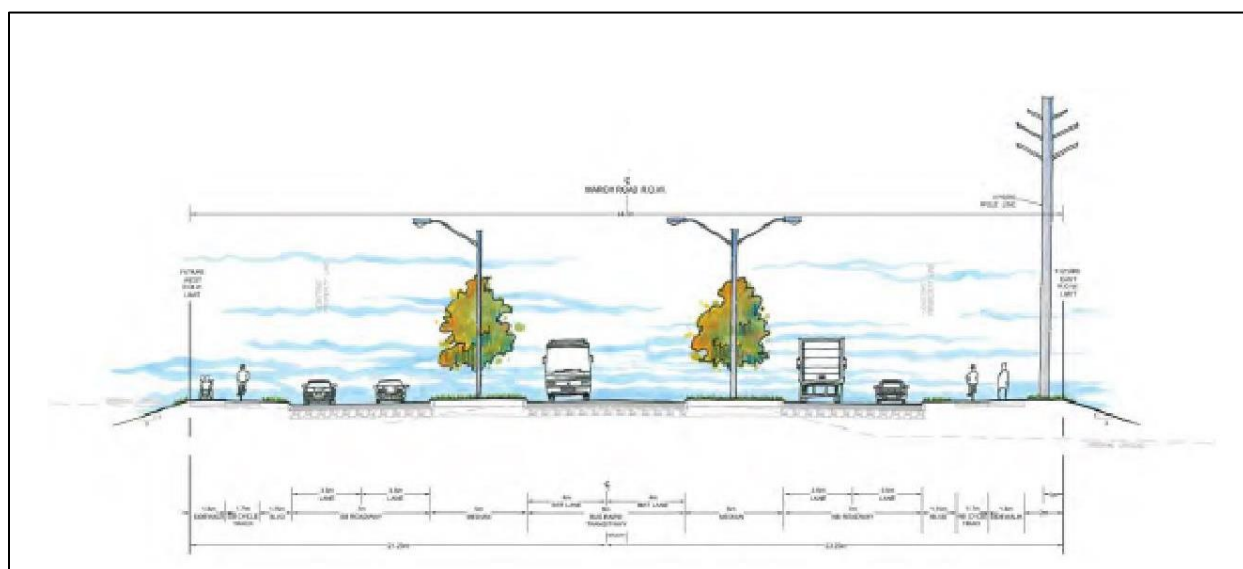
Excerpt from Kanata North Community Design Plan – Cross Section for March Road - Ultimate.
